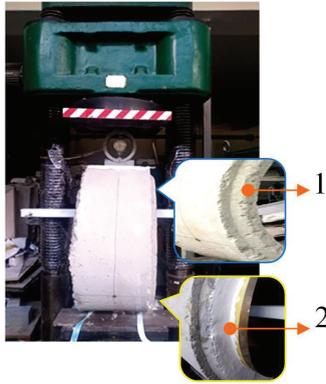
General view of pipes under study: 1 – pipe without reinforcement; 2 – the pipe is reinforced with a metal clamp
